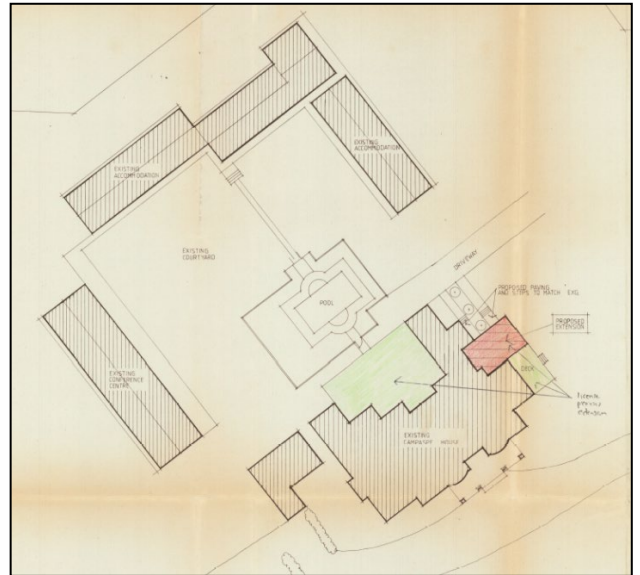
Plan of the property dating to 2002, showing extant buildings. The red and green coloured areas show proposed extensions that were not carried out (MRSC PF).
